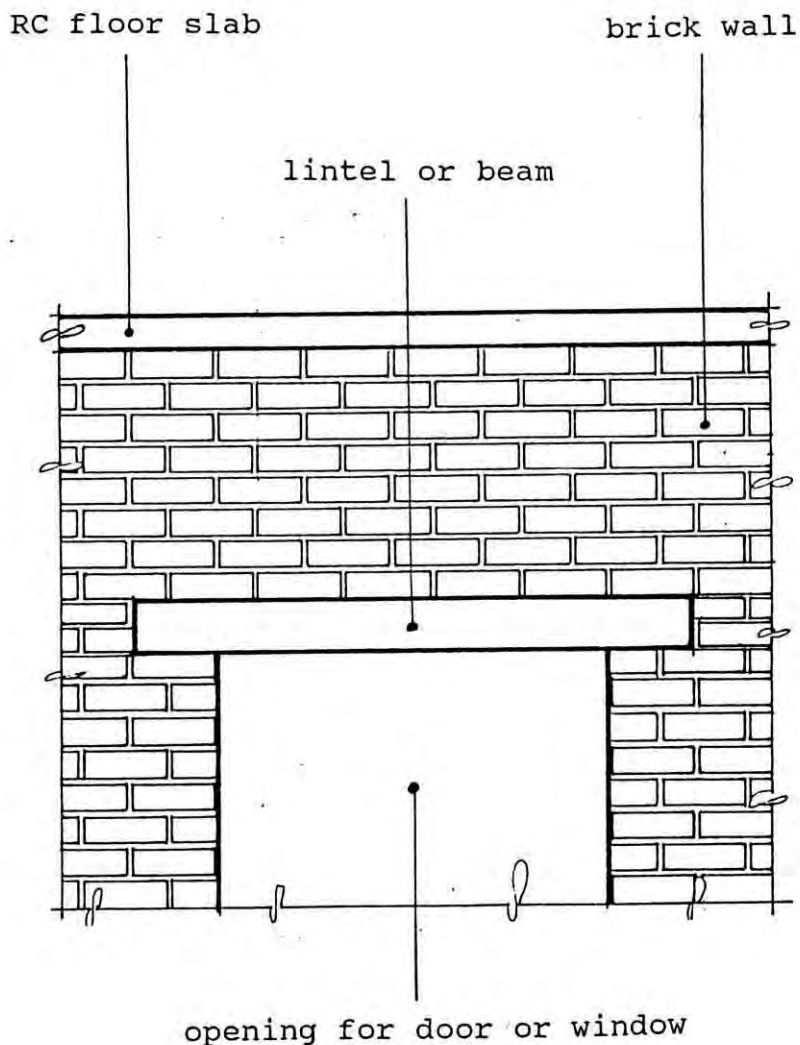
Load Bearing Brick Wall Over Reinforced Concrete Lintel
